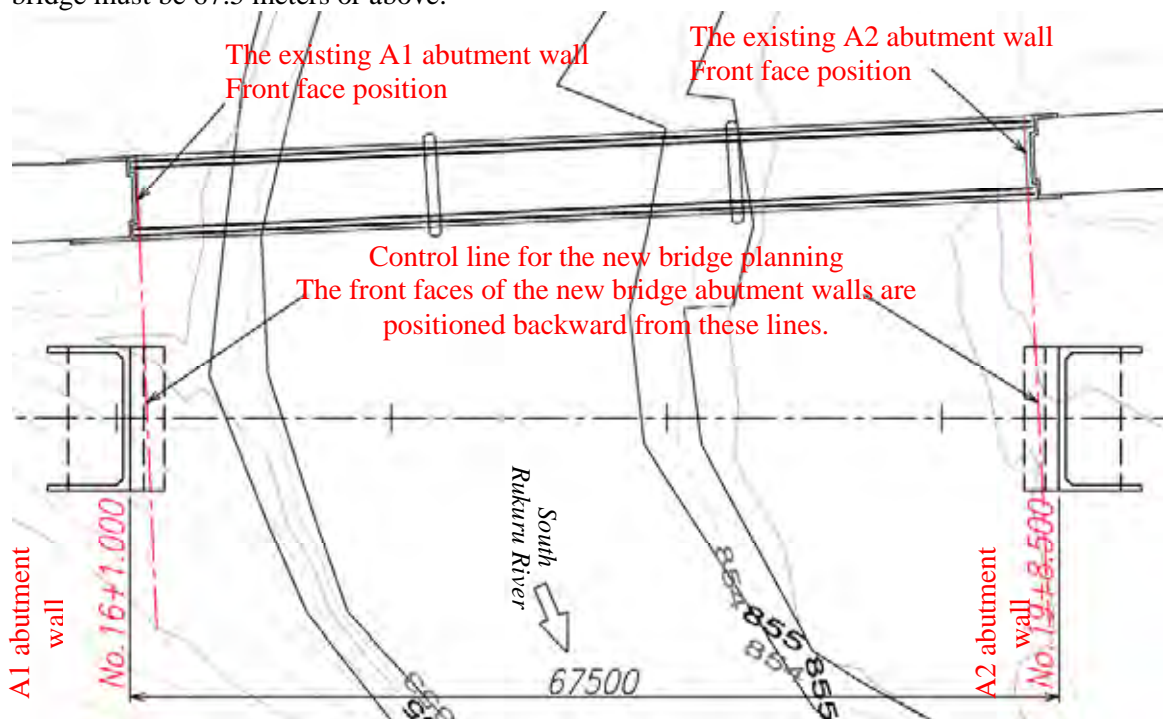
The New Bridge Abutment Positions (minimum necessary bridge length)
